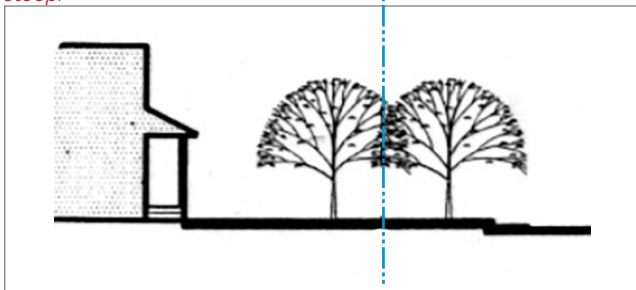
Open Front Yard. A facade set back substantially from the frontage line. The front yard thus created should remain unfenced and be visually continuous with adjacent yards.
